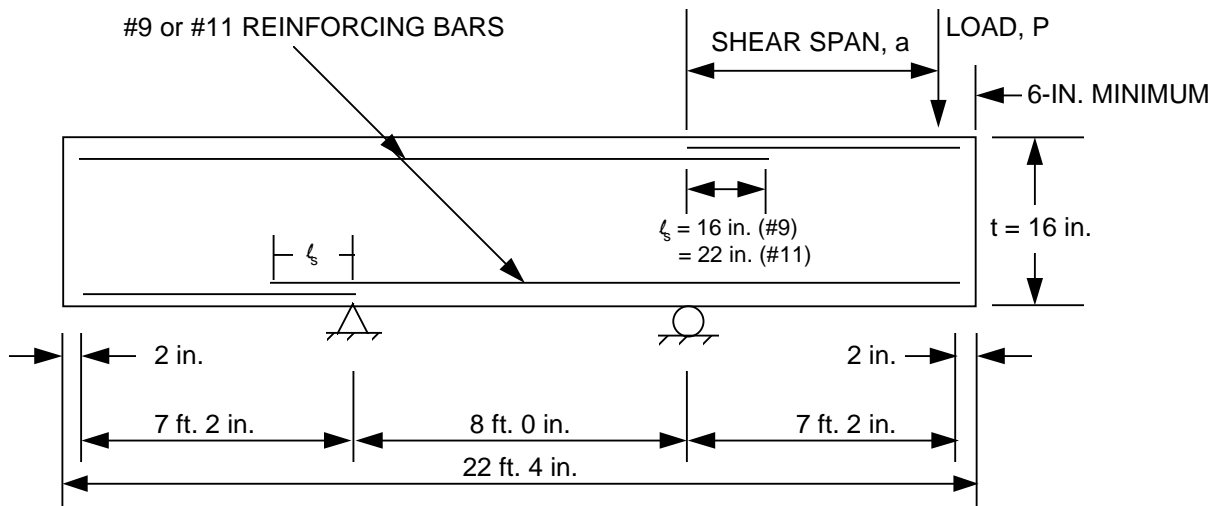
Side view of test specimen (load shown for top cast splice test (Ref. 16))
